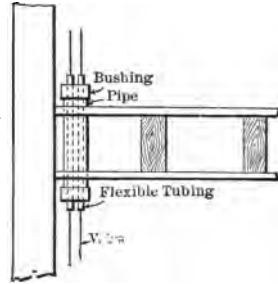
Wires protected by flexible tubing, running through iron pipe.
